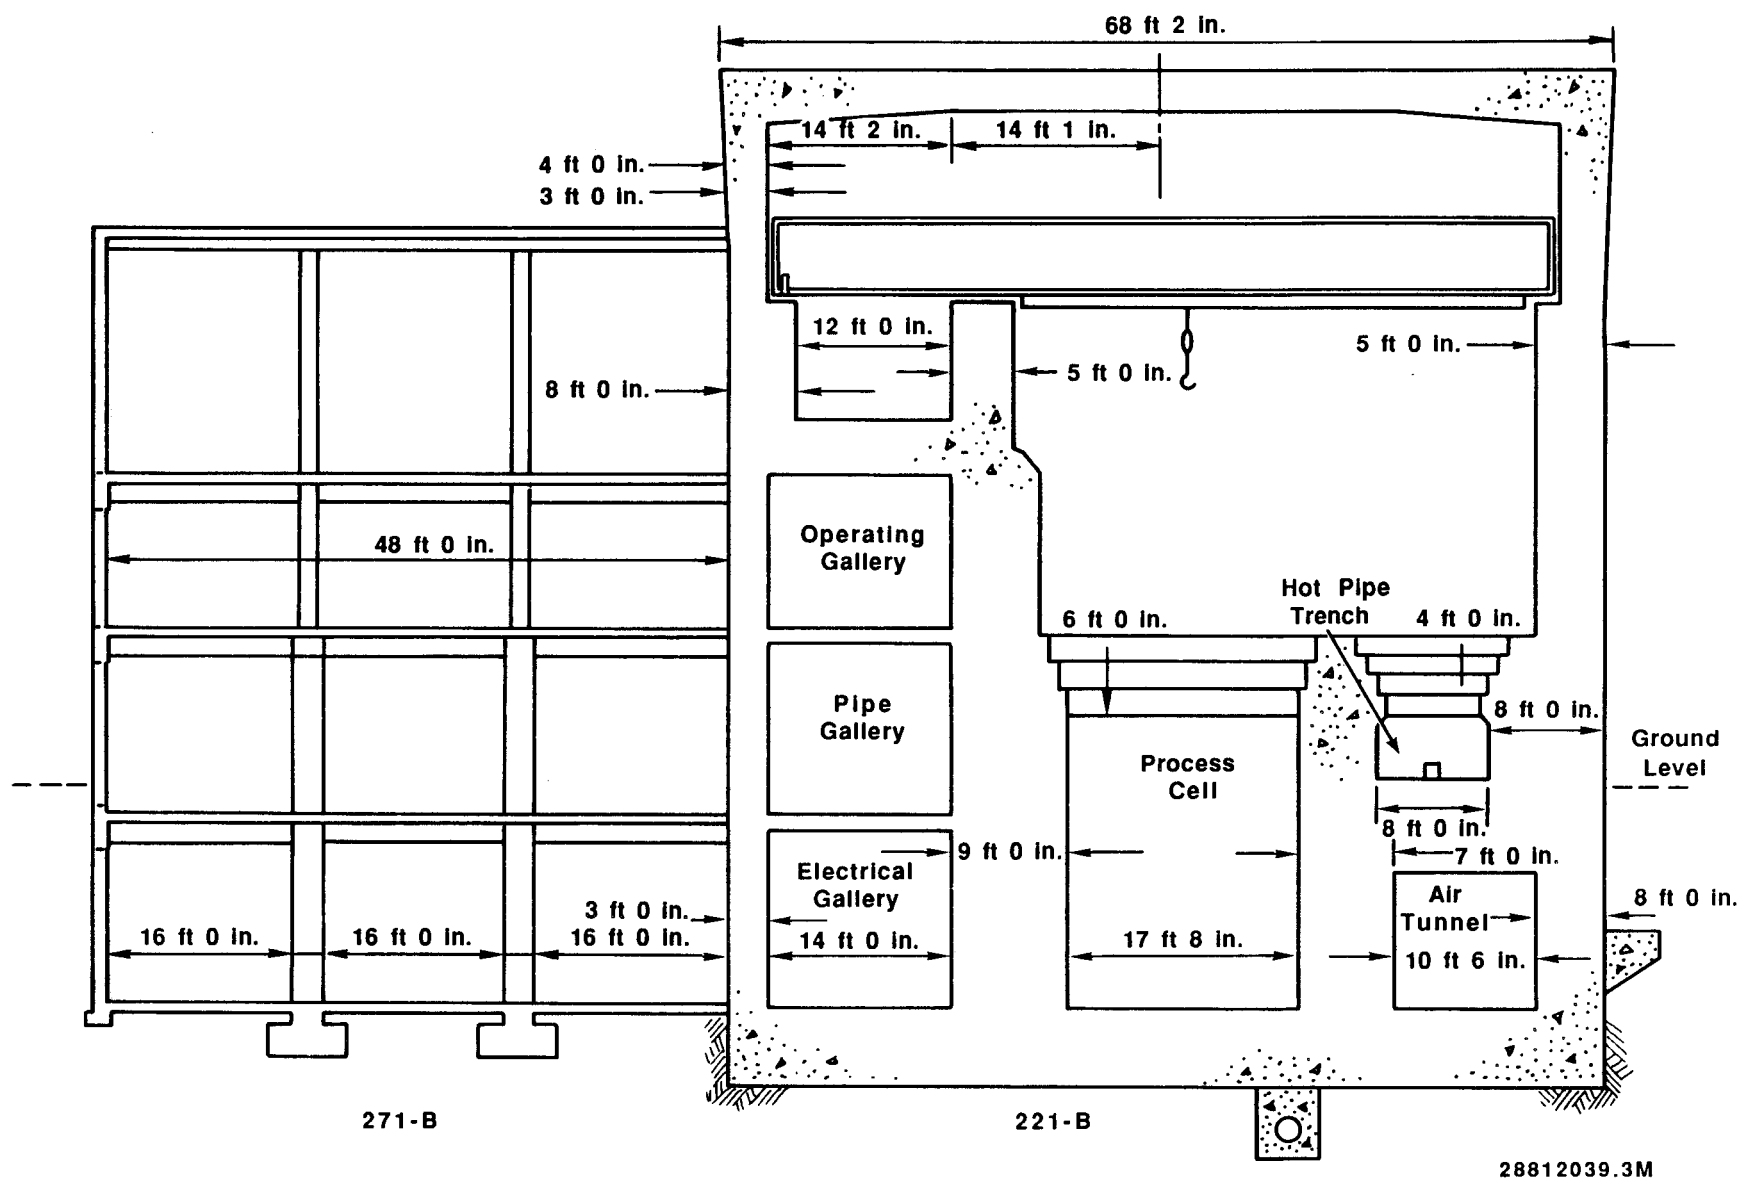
Typical Cross-Section of Buildings 221-B and 271-B.
